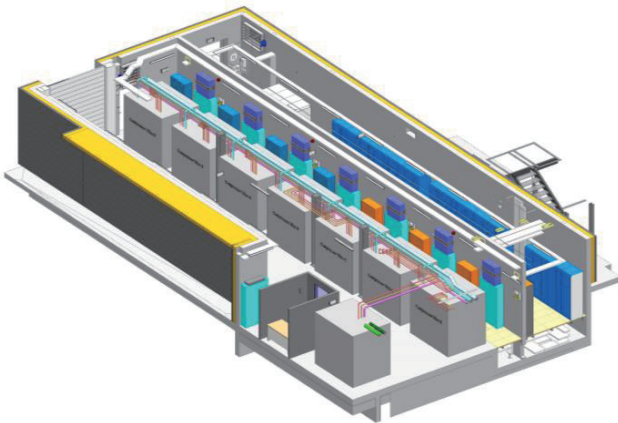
Future ATLAS machine room for the primary cooling final systems composed of seven compressor modules.
